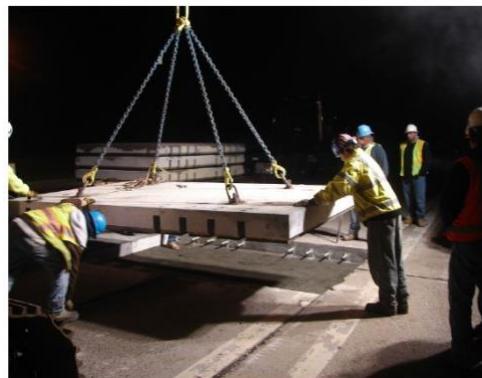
Precast concrete slab being lowered into place (Snyder 2012)
